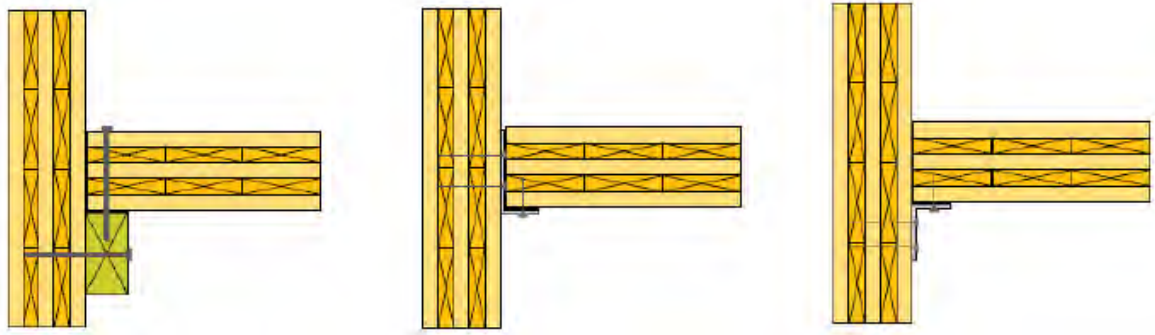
Typical wall-to-floor X-Lam connections in balloon construction (FPInnovations, 2013)
